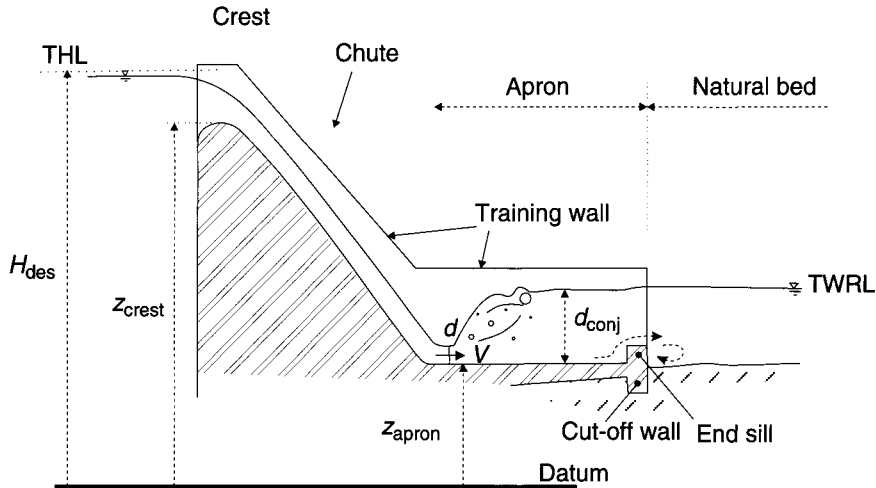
Design of an overflow spillway with hydraulic jump stilling basin.
